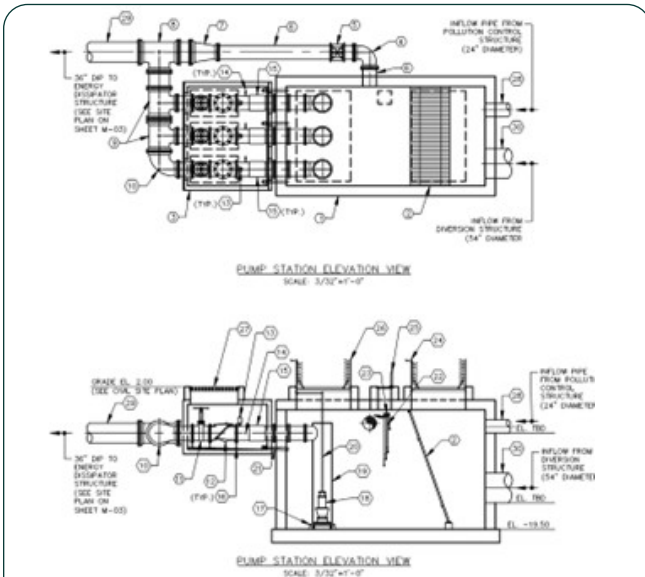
Typical Stormwater Pump Station Preliminary Design Cross Sections.
